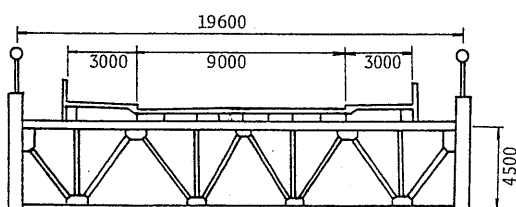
Cross-section of Wakato Bridge before refreshment.
